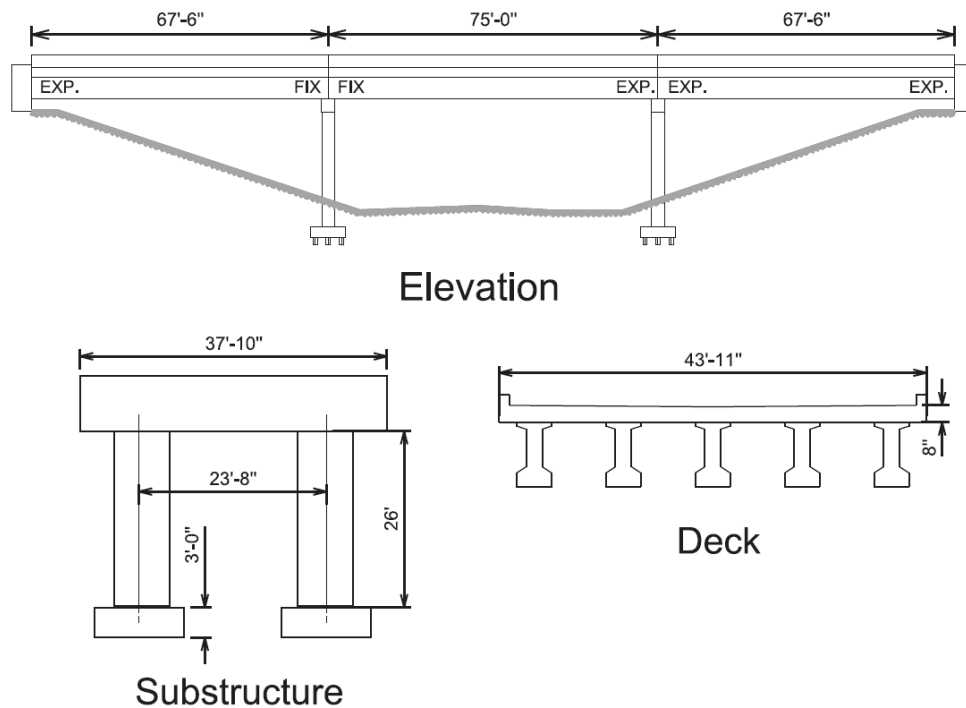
Multi-Span Simply Supported Concrete Girder Bridge Layout.
